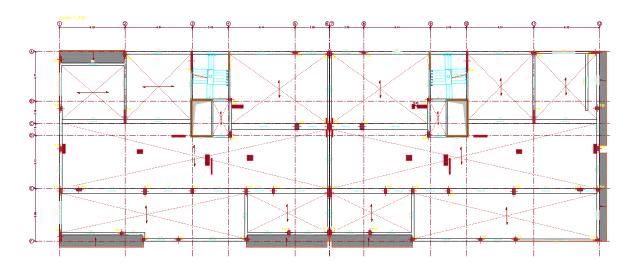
Floor structural plan (CIVI4, 2015).
